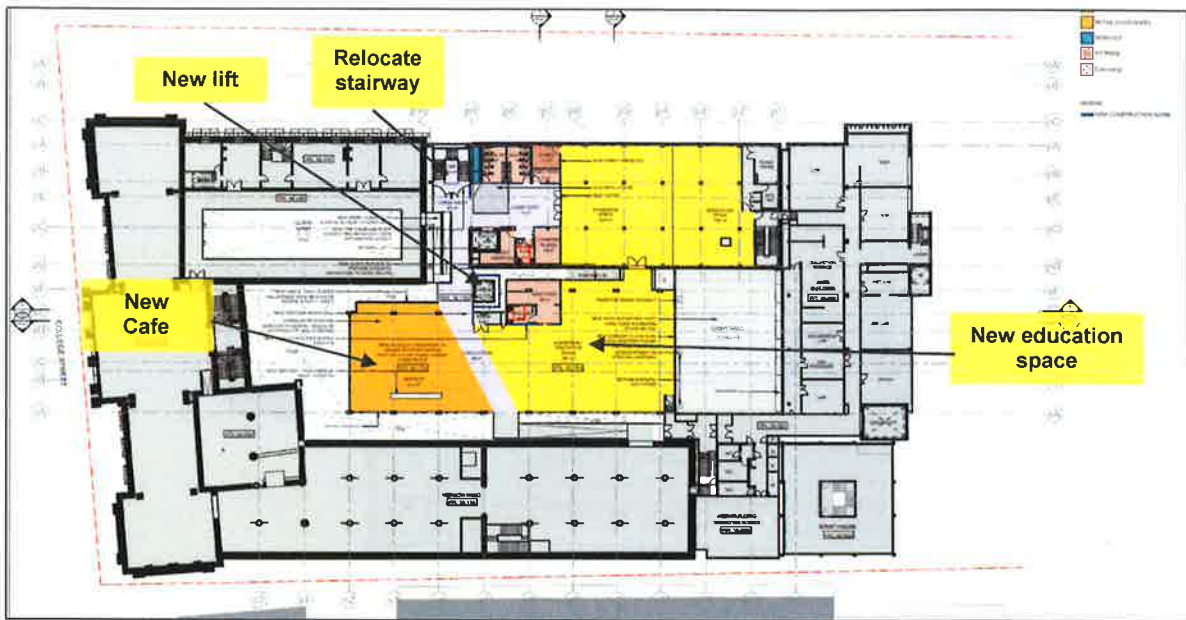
| Level 2 floor plan (Source: Applicant's RtS).
